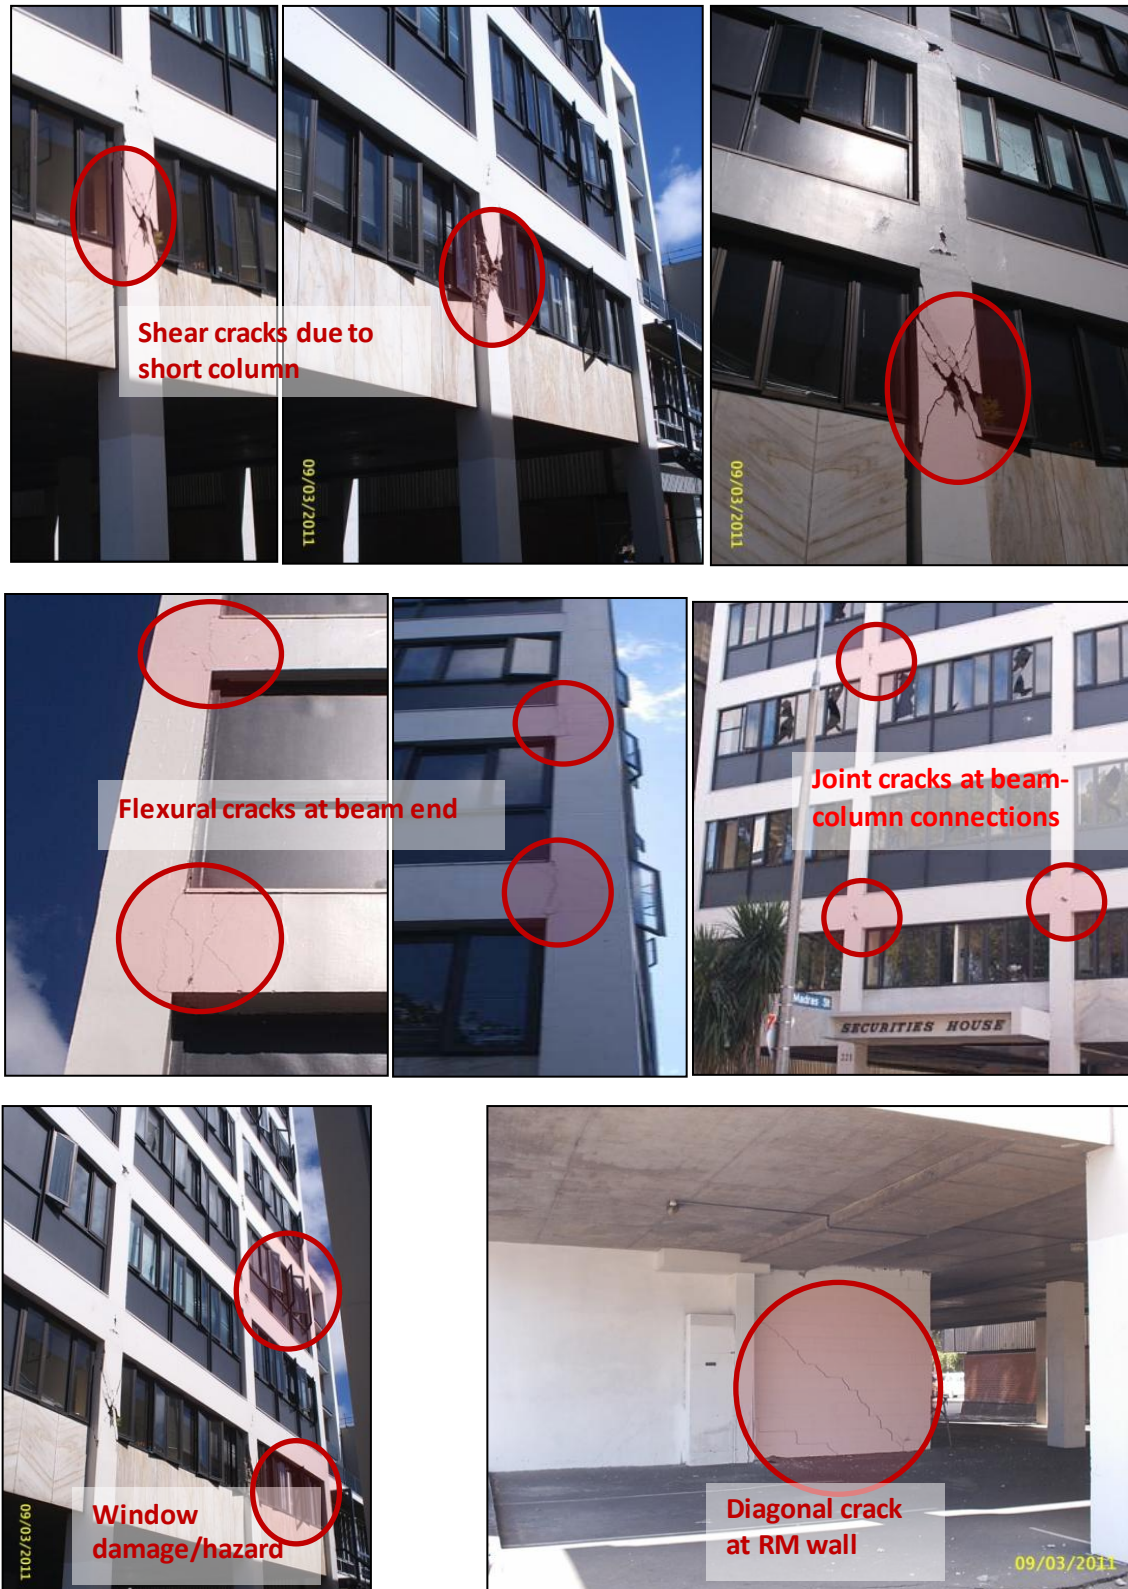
Photos showing the observed damage to the building (Pampanin et al. 2012).
